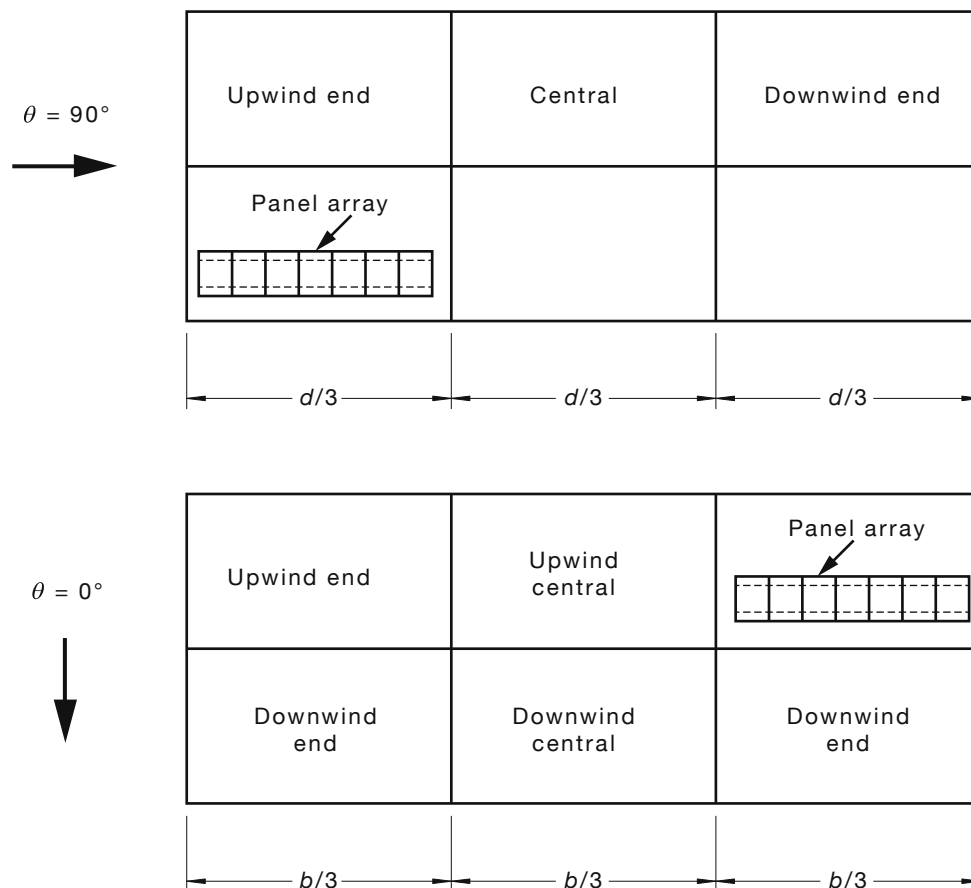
ROOF ZONES FOR PANEL ARRAY
